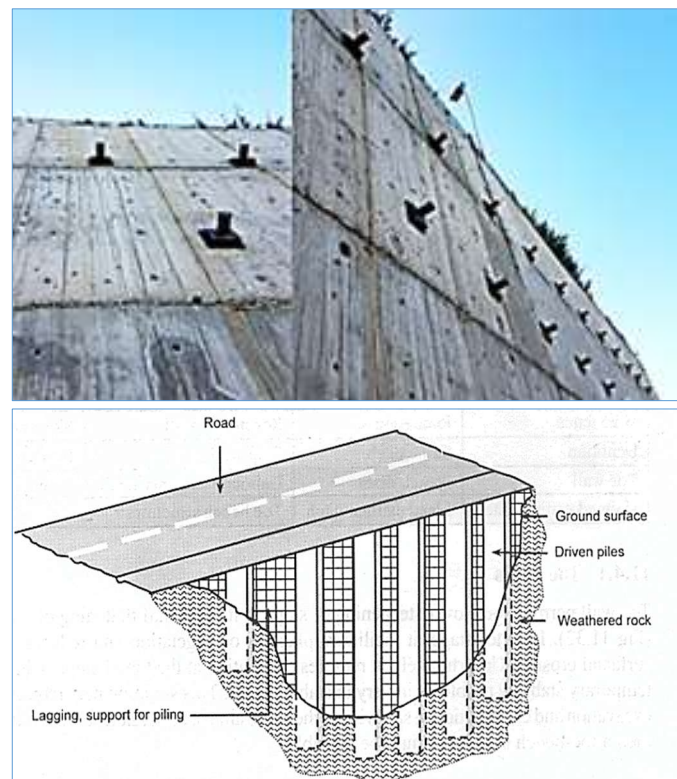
Pile and tie back wall at the mountains and sloppy areas (adopted from open source)
